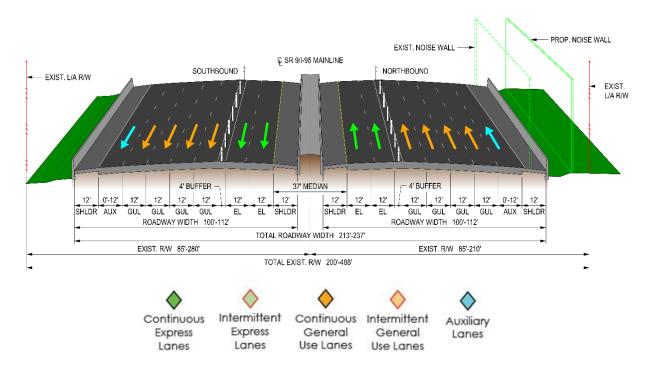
1: Proposed Typical Section - Alternative 1 - I-95/SR 9 Mainline and Express Lanes
